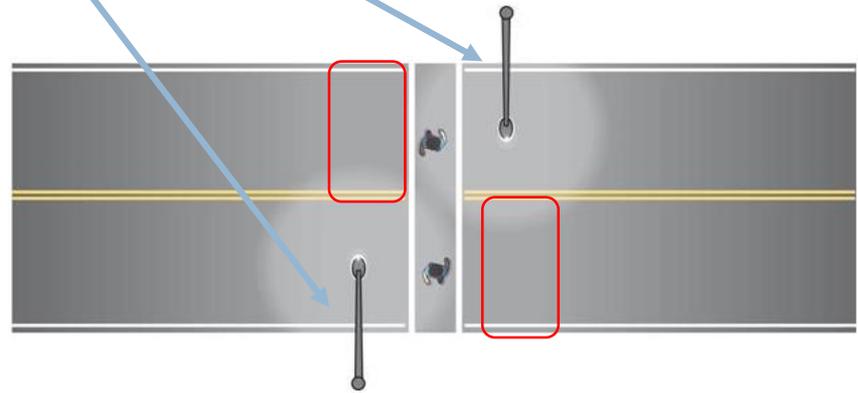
Drawing. New design for midblock crosswalk lighting layout.
